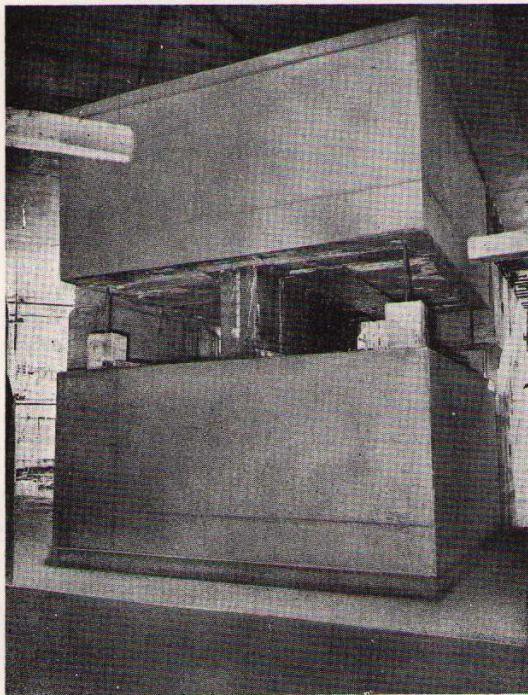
Pier with steel shaft carrying 7,500 tons.
